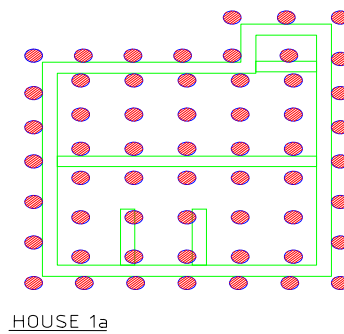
Column layout for a typical house (Hildedal, Gothenburg, Sweden).
